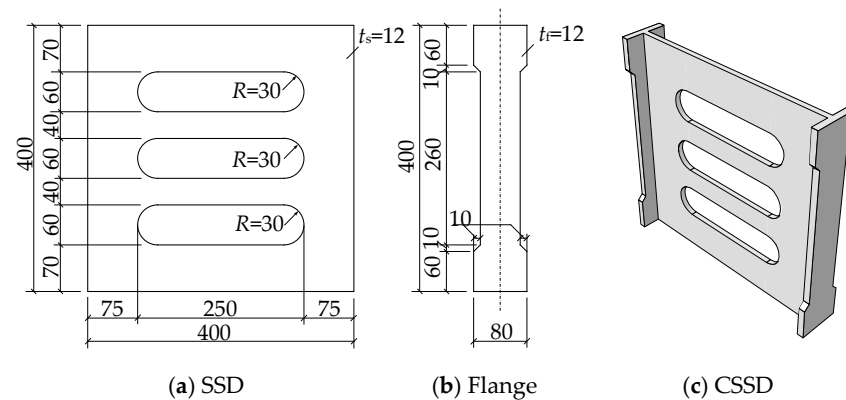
Configuration of the combined soft steel dampers (CSSD) device (all dimensions in mm): (a) soft steel damper (SSD); (b) flange; (c) CSSD device.
